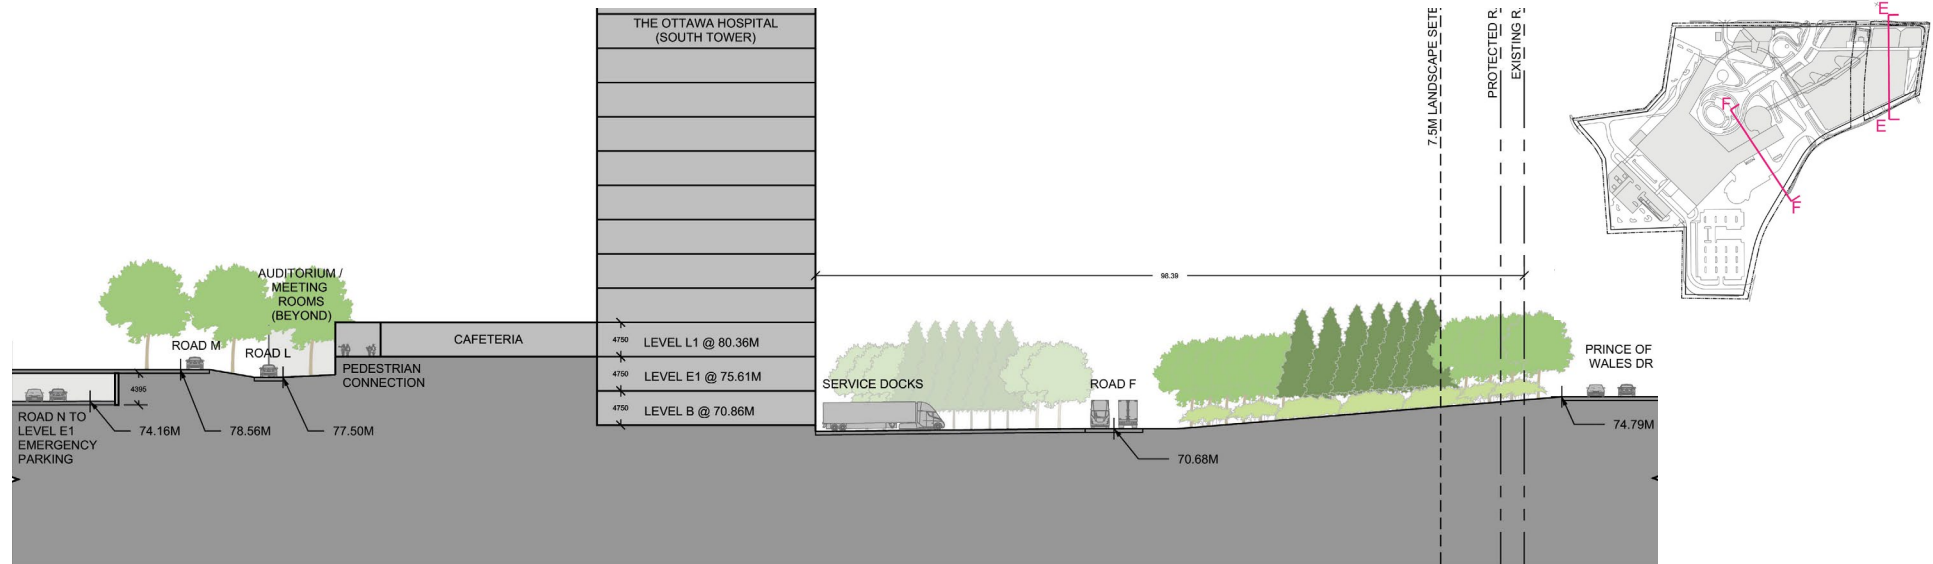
Section F Looking East at Prince of Wales Drive and Hospital Service Docks
